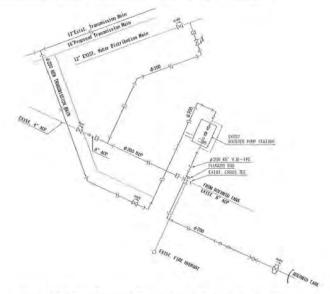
Proposed Connections to Ngermid Service Tank
